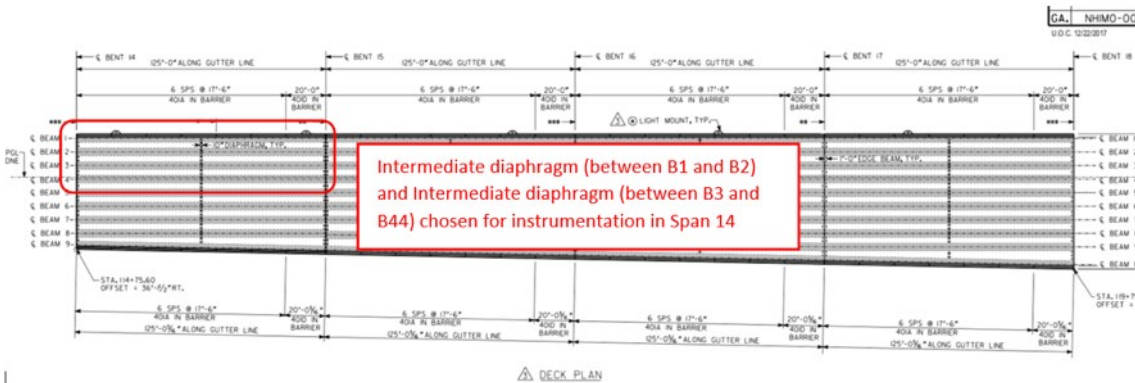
Drawings. Deck plan of Span 14, Bridge 11B
